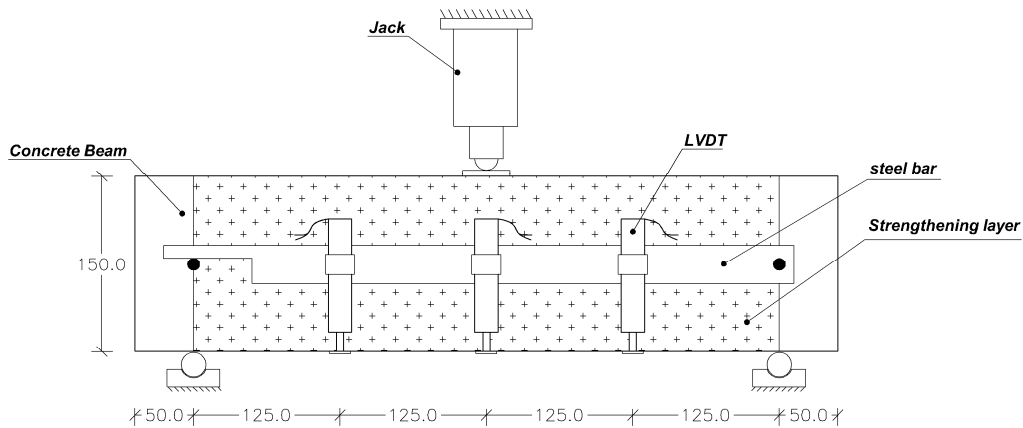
Details of the three point beam bending test setup (dimensions in mm)
